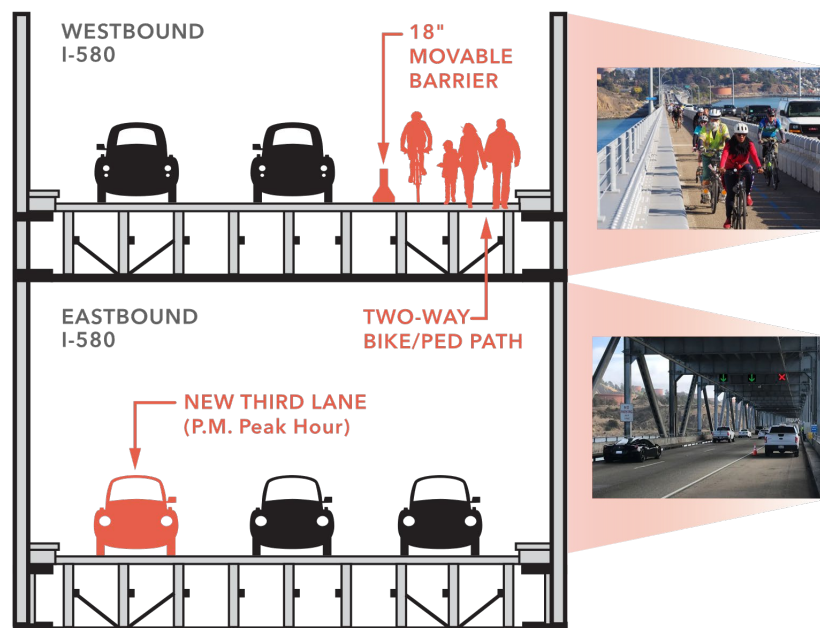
Current Pilot Configuration, Bridge Cross-Section (looking west)
